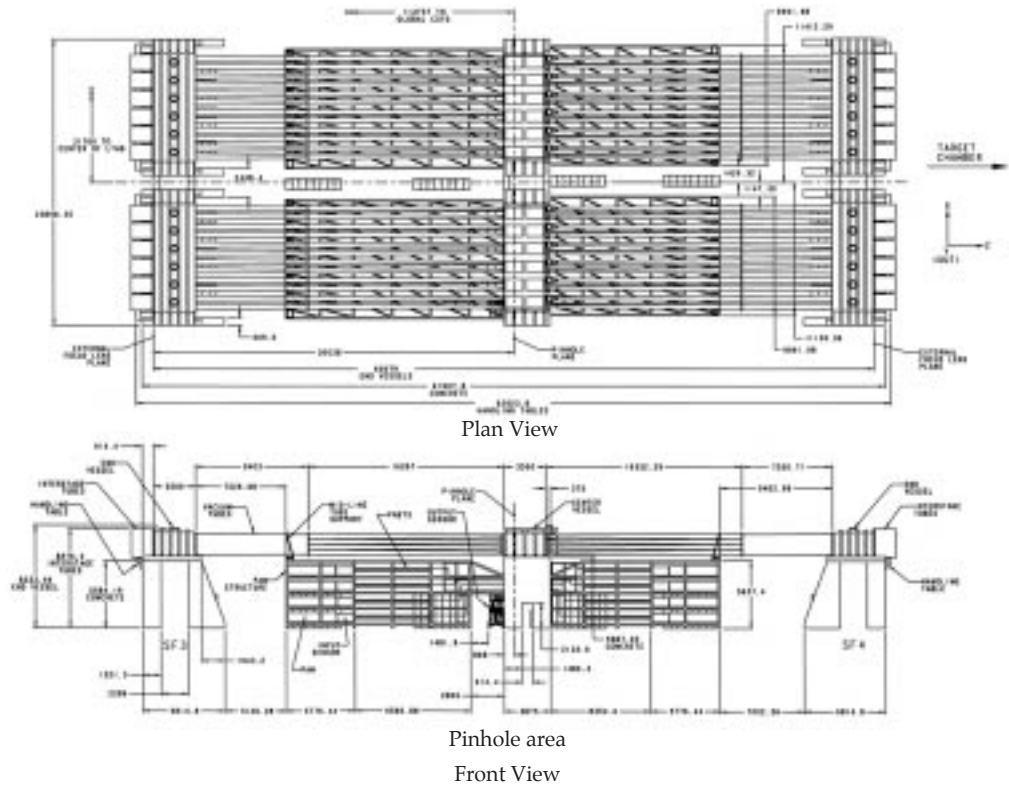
Plan and elevation of the TSF support structure. All distances are in millimeters. (40-00-1097-2296pb01)
